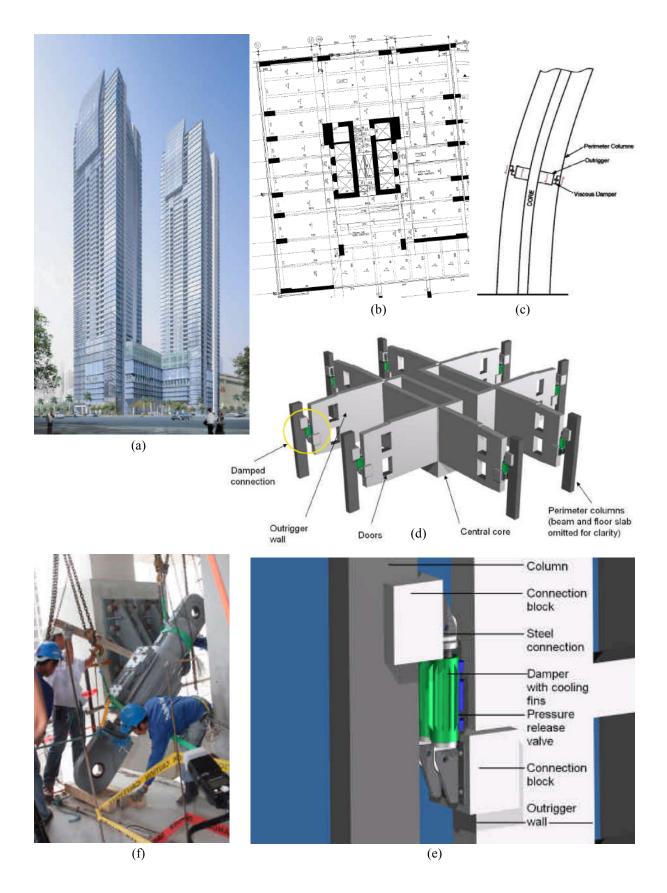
Clockwise from top left: St. Francis Shangri-La Place (a) architectural rendition and (b) typical structural plan, designed with Arup Damped Outrigger System, patent pending: (c) concept, (d) damper layout around core wall, (e) close-up view of damper, (f) installation of actual dampers. All images from Ref. 7.
